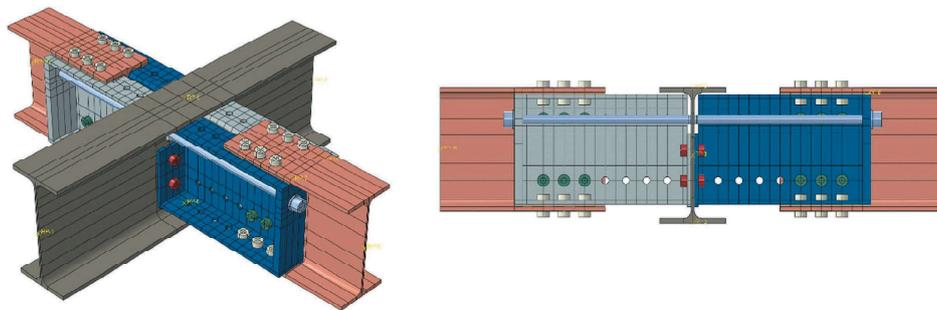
Moment-resistant joint. Beam-to-beam connection.
